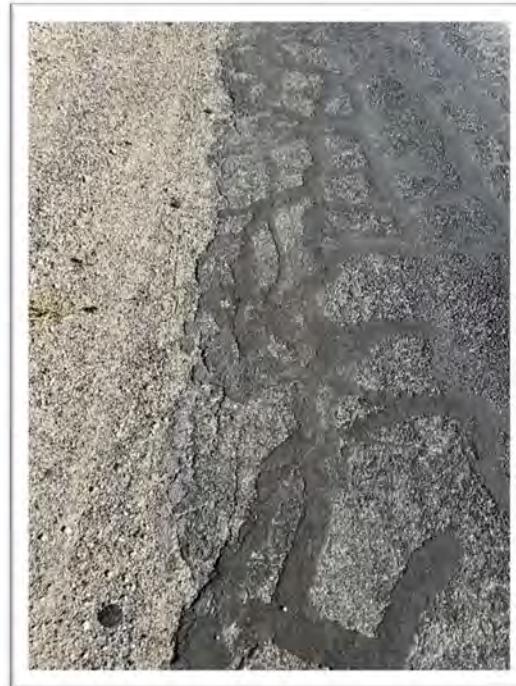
Additional Fatigue Crack Sealing on Road Edge
